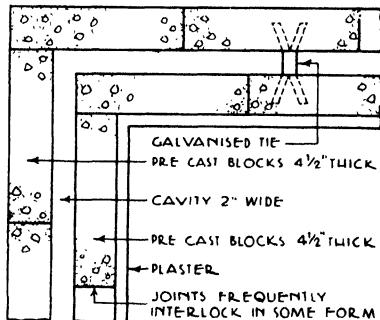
CAVITY WALL OF PRECAST CONCRETE BLOCKS
